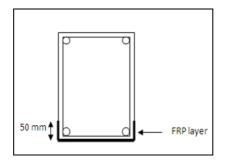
Cross section after bonded with FRP where FRP extends 50 mm on each side.
